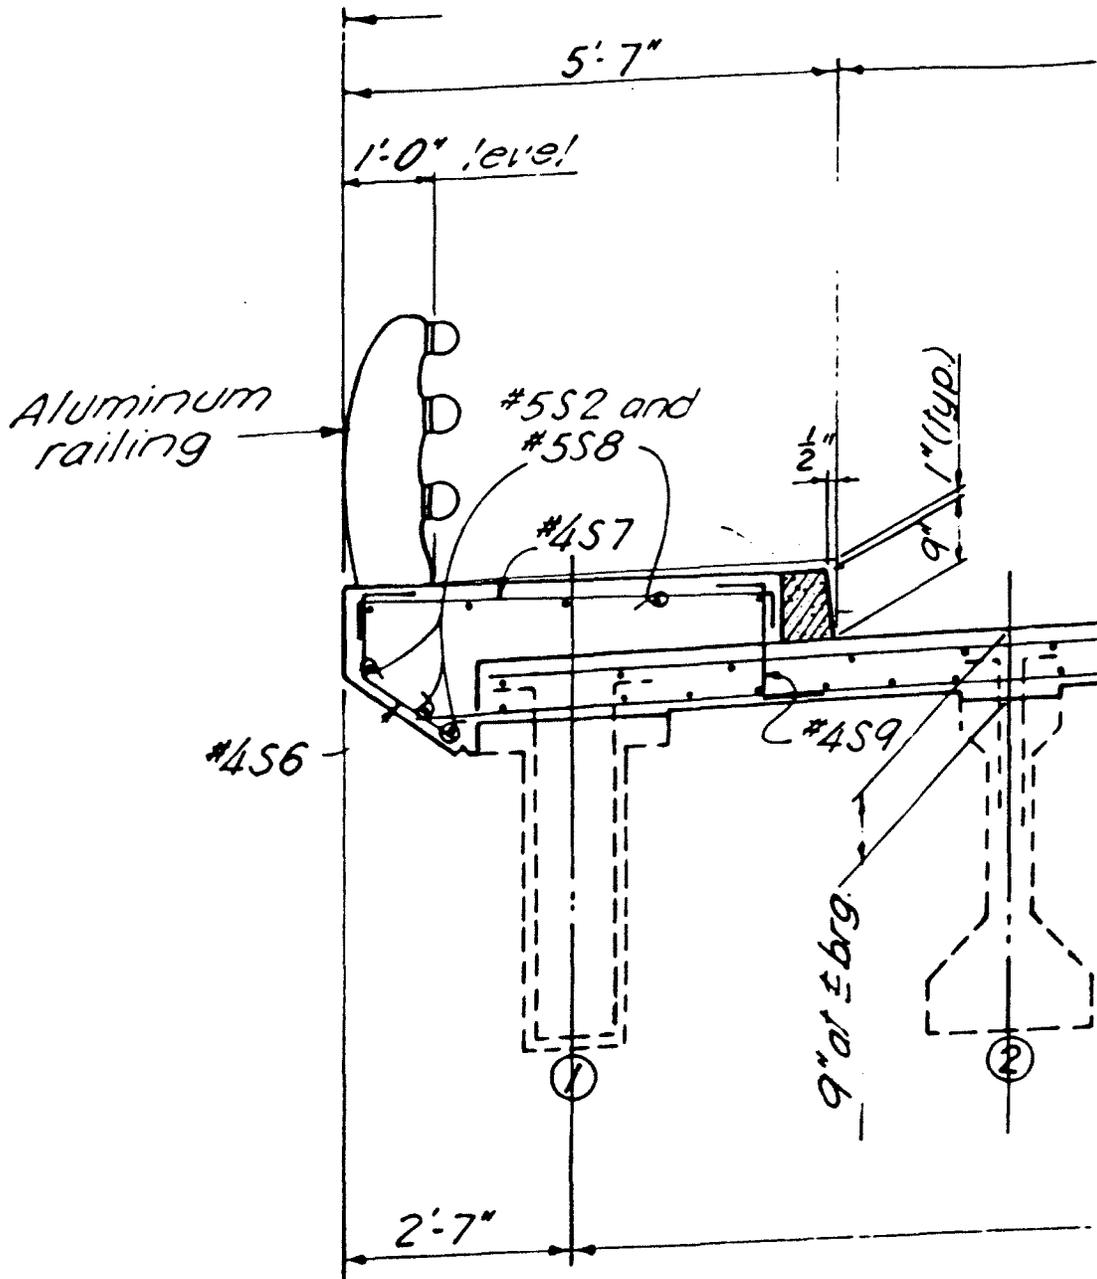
Aluminum Tri-Rail bridge rail with sidewalk (continued).
